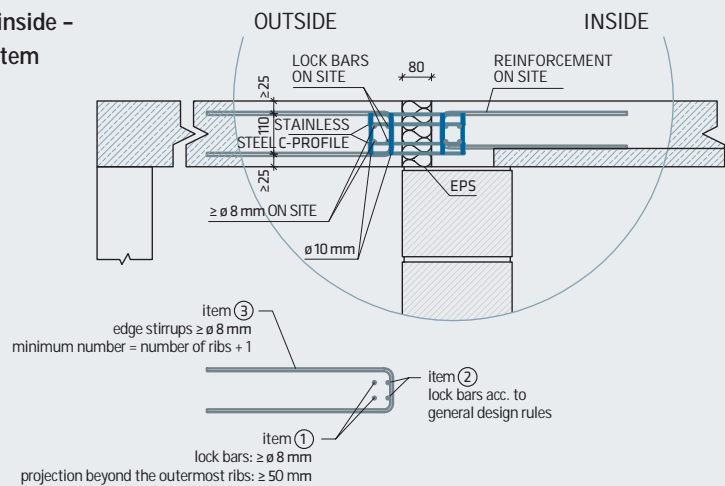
Supported balcony with precast slab elements inside and TKQ
